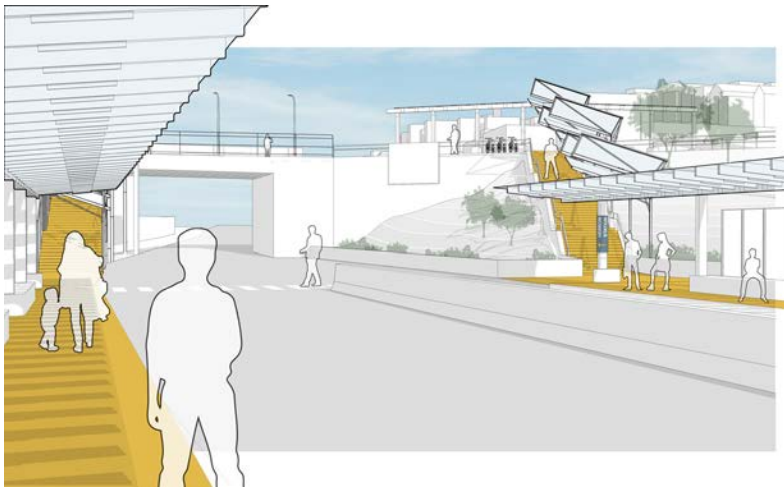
View from the new inbound platform to the Herron Avenue transit plaza
